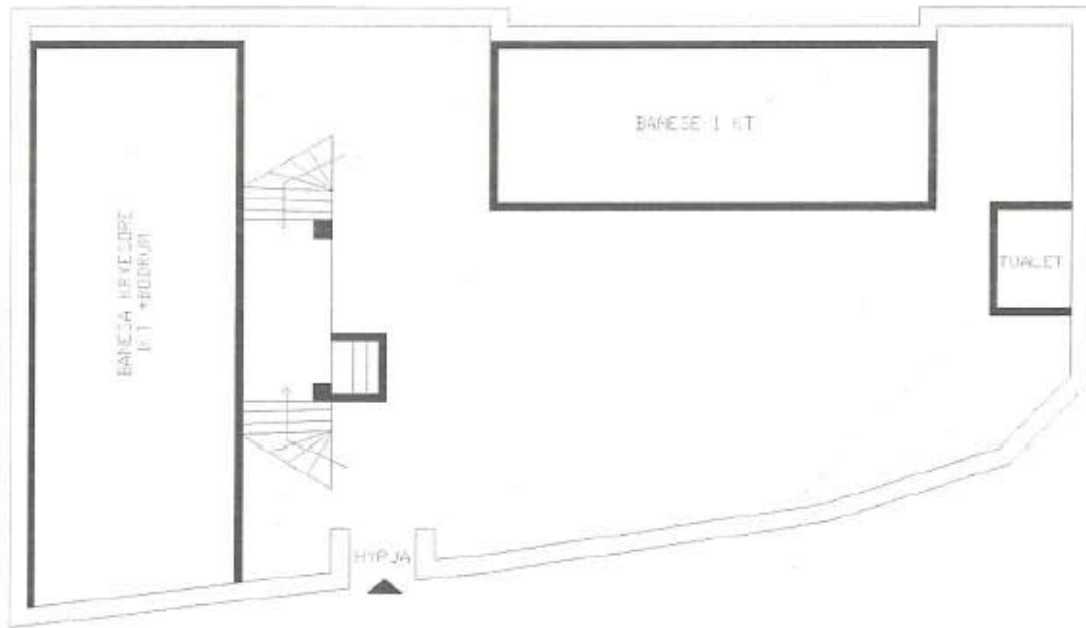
Ground Floor Plan (Source: Vilat e Tiranës, Dr. Vera Bushati)
